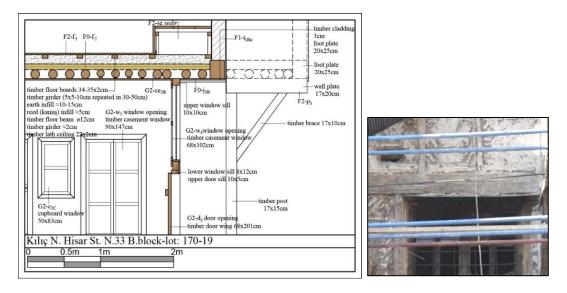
Connection detail 3, detail of use of timber framed walls in both floors in case of existence of projection (Kılıç N. b.block-lot:170-19)
